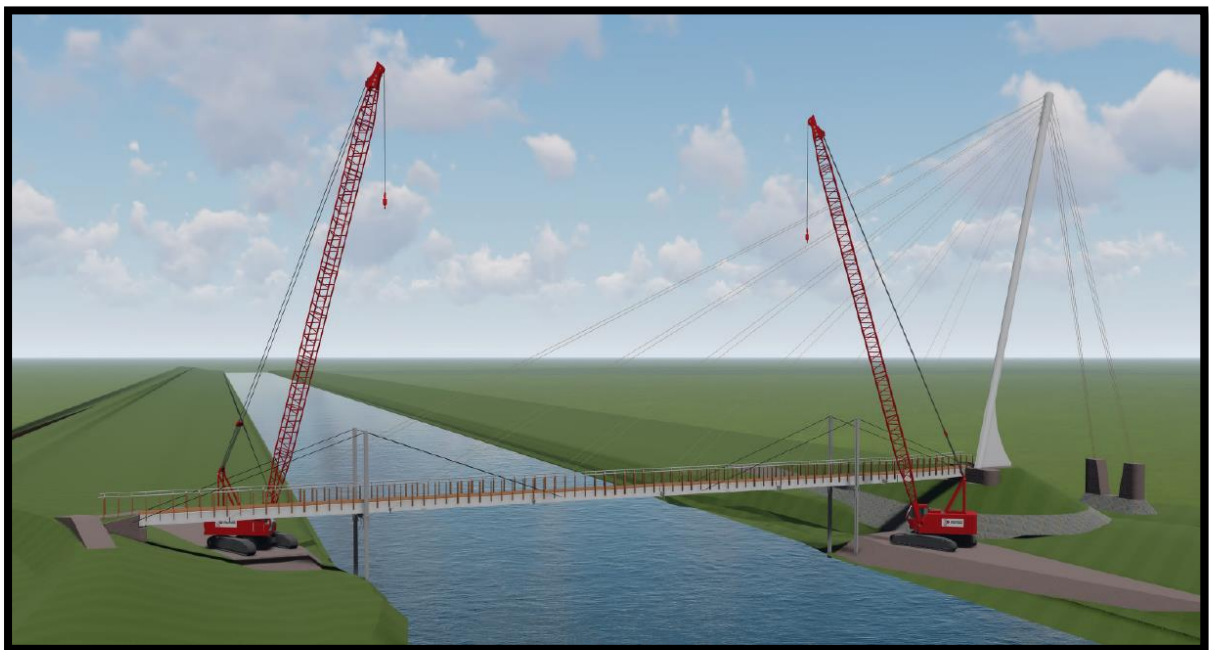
Longford Bridge construction, showing the temporary piles and crane platforms (Source: Concrete Structures Ltd, 2019, extract from Appendix C)
